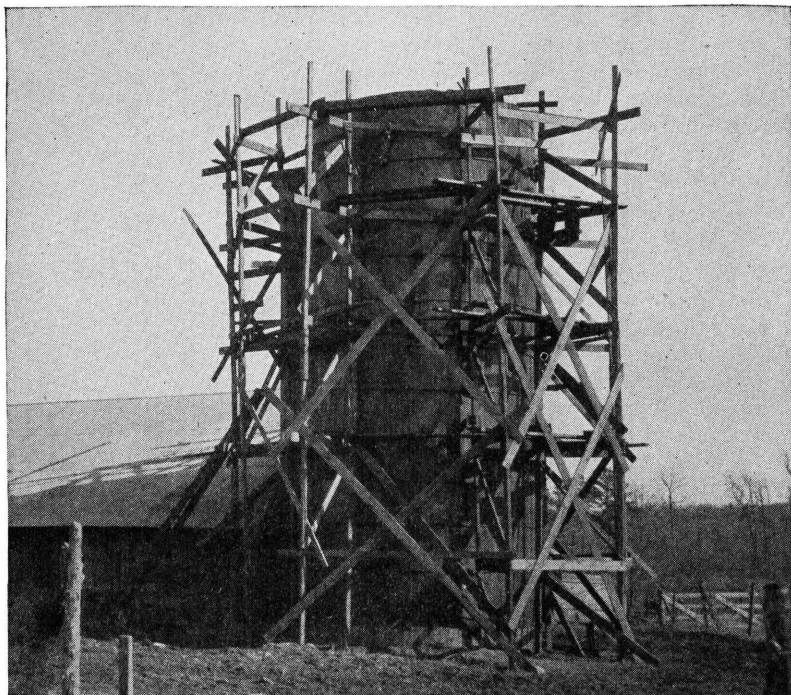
Outside scaffolding for erecting a wood silo.
